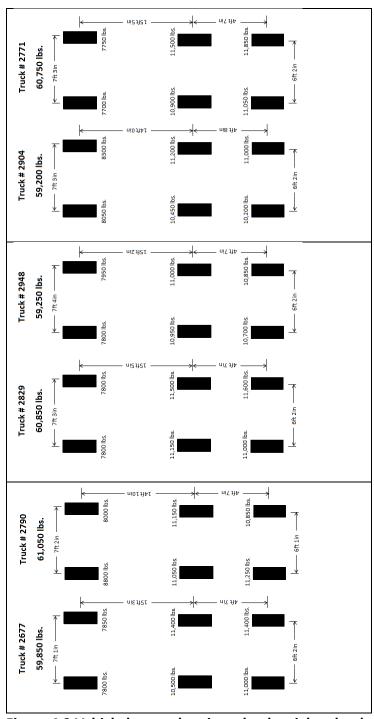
Vehicle layout showing wheel weights: load test 3
